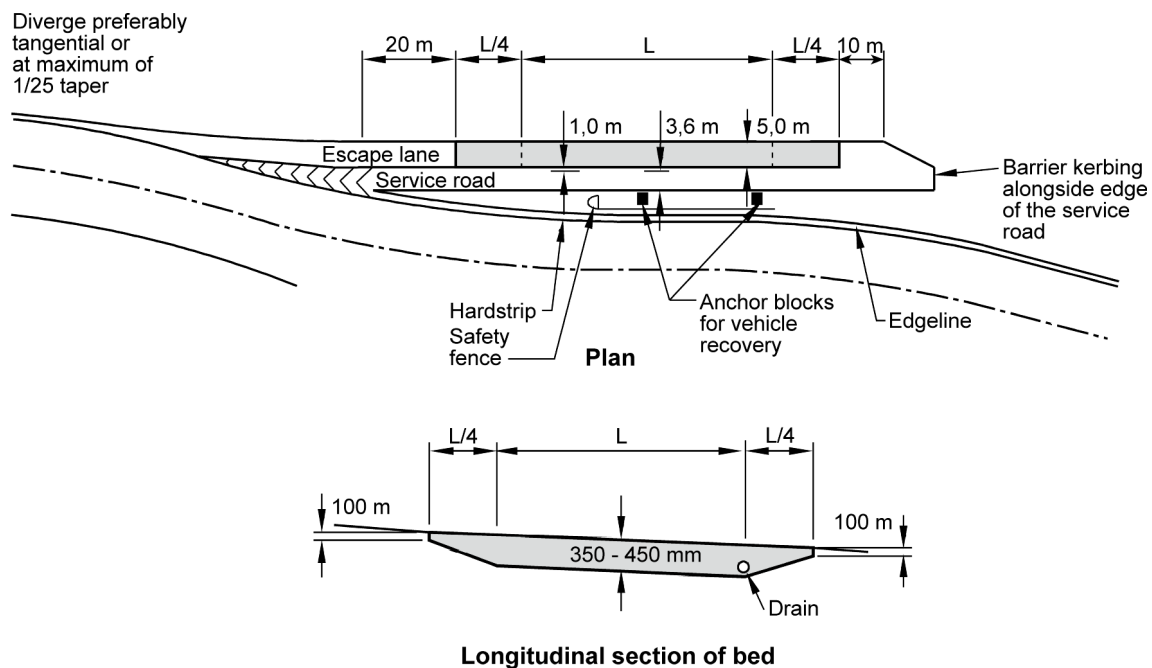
Layout of arrestor bed adjacent to carriageway
